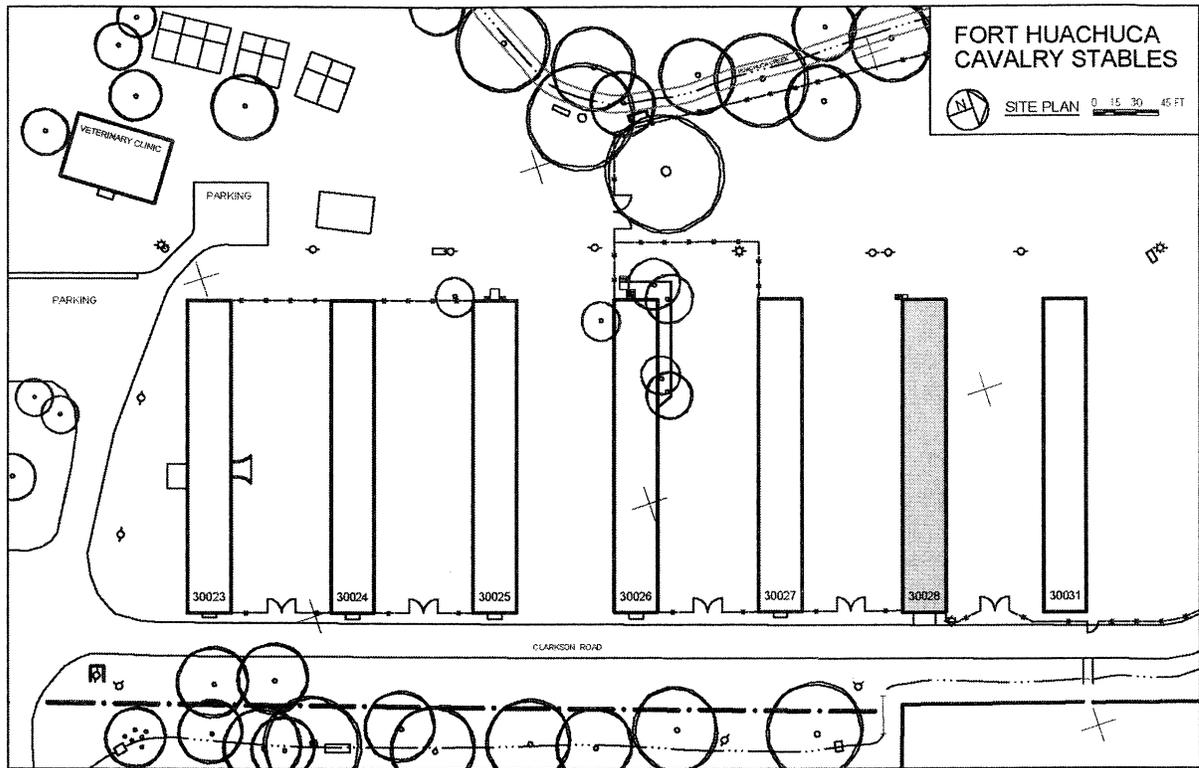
SITE PLAN SHOWING BUILDING 30028 LOCATION.
